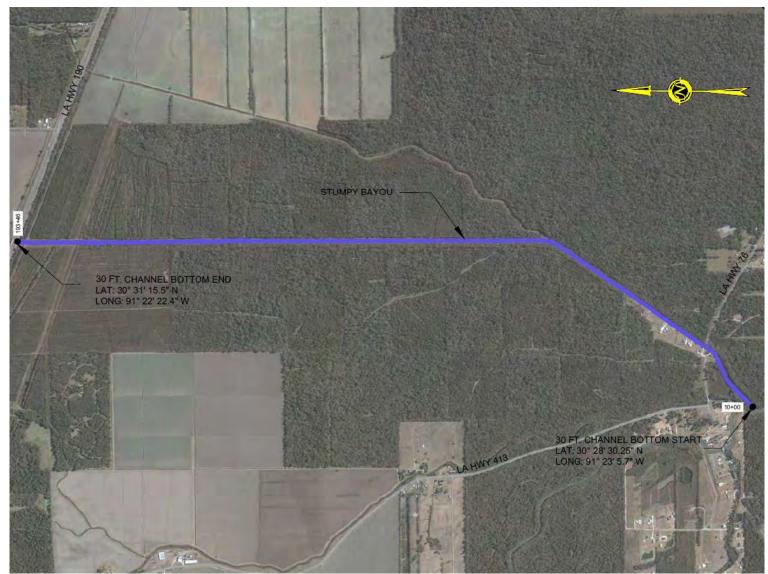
Plan View for the proposed 30 ft. channel bottom width segment of Bayou Stumpy for approximately 3.5 miles for the Bayou Stumpy Watershed Drainage Improvements Project provided by GIS Engineering, LLC.
